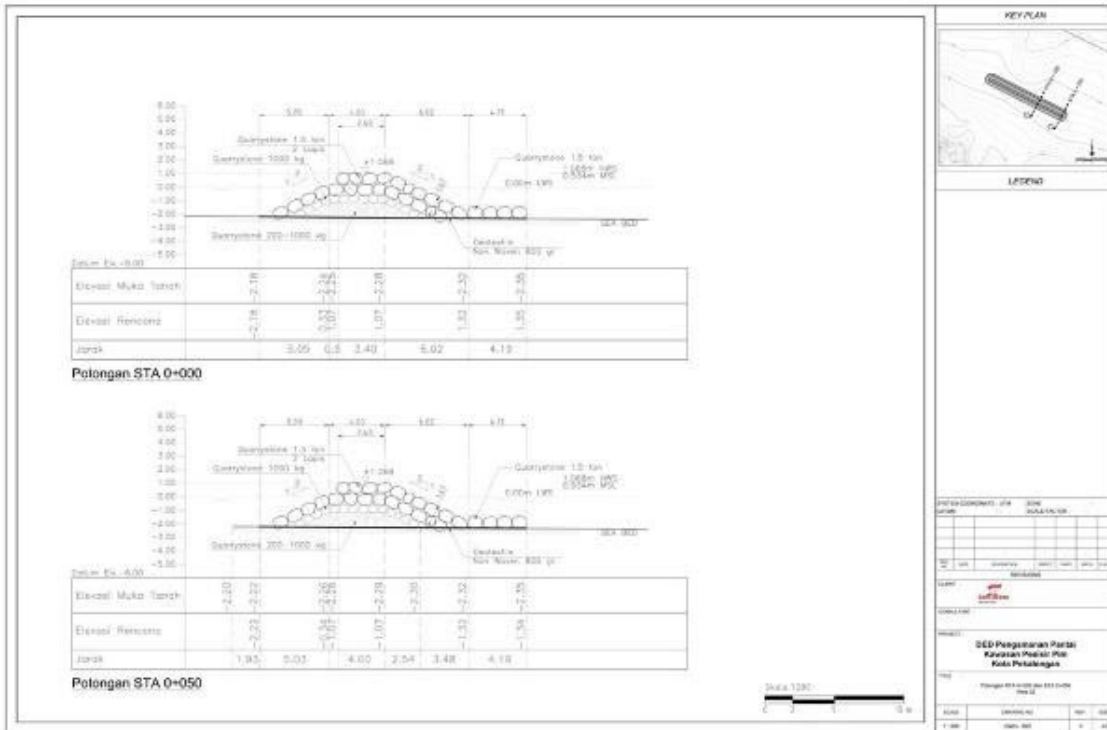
STA 0+000 Cross Section – STA 0+050 Area 2 Breakwater
